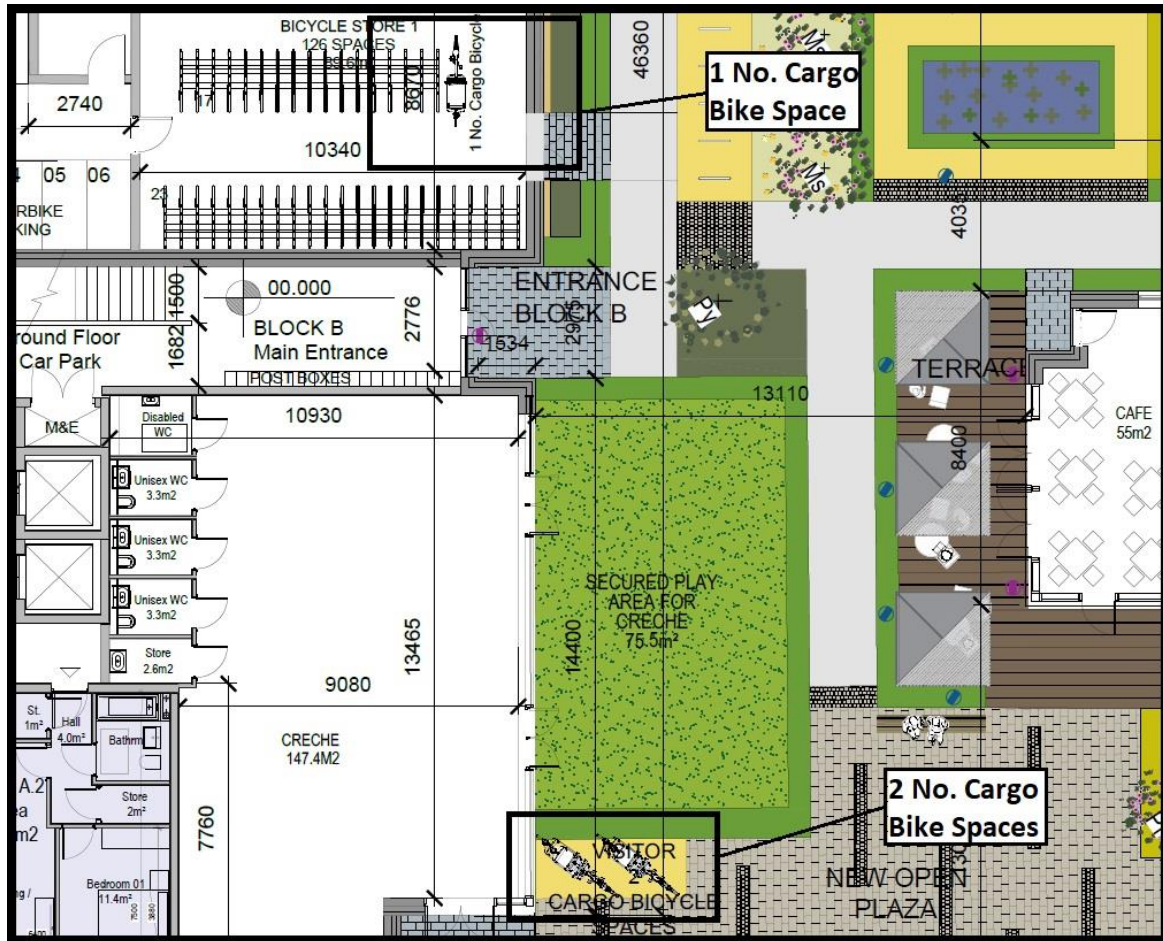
Ground Floor Plan Extract Showing Cargo Bike Spaces (incl 2 No at Crèche)
